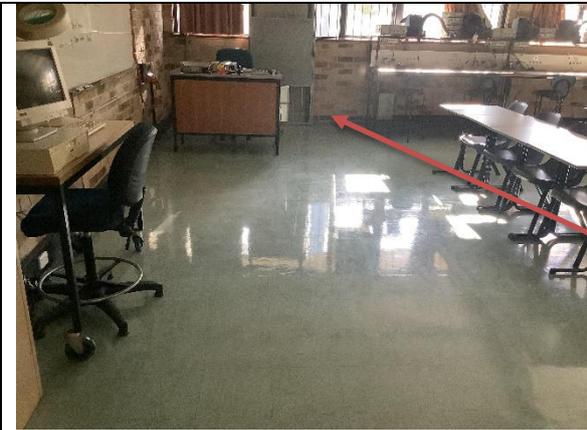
Building G – G.1.28 – Throughout – Floor Covering – Vinyl Tiles - Grey
